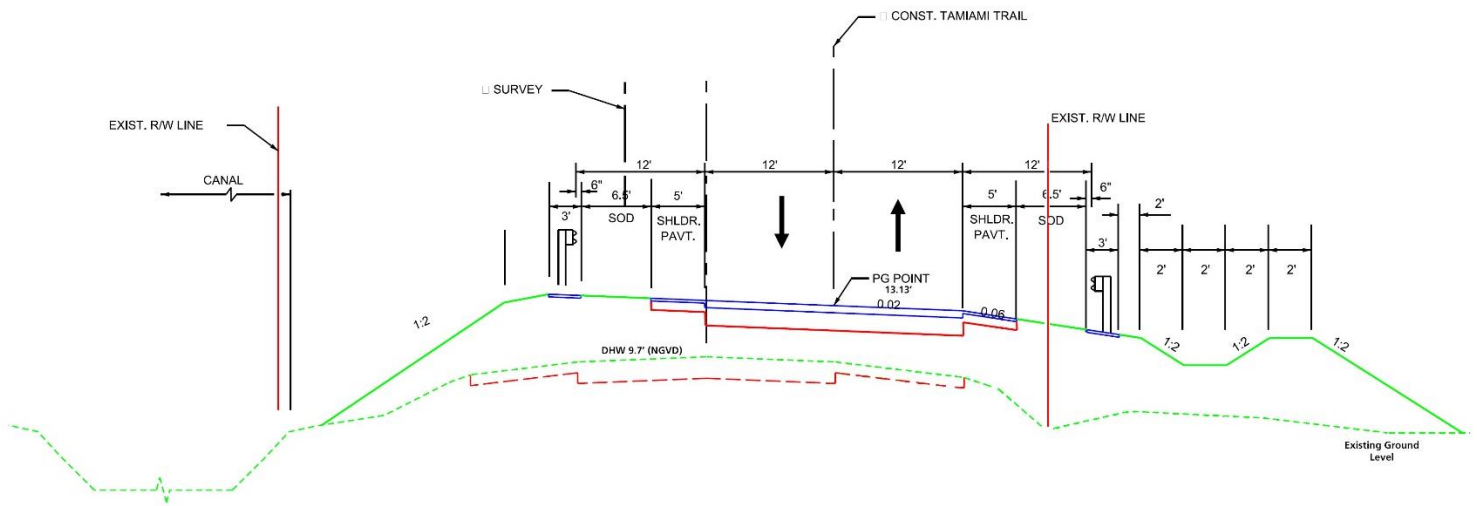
Typical cross-section of the reconstructed Tamiami Trail roadway looking east with the L-29 canal/left and ENP/right (Engineering Report, Appendix A, Tamiami Trail Next Steps Final EIS). The roadway will be raised several feet (with a crown elevation of just over 13 feet NGVD), and shifted to the south to maintain embankment stability.
